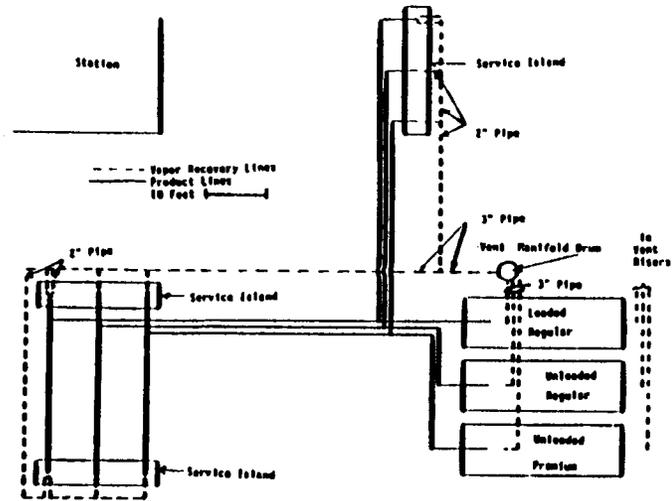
Stage II Underground Piping Layouts for Model Plant 3
